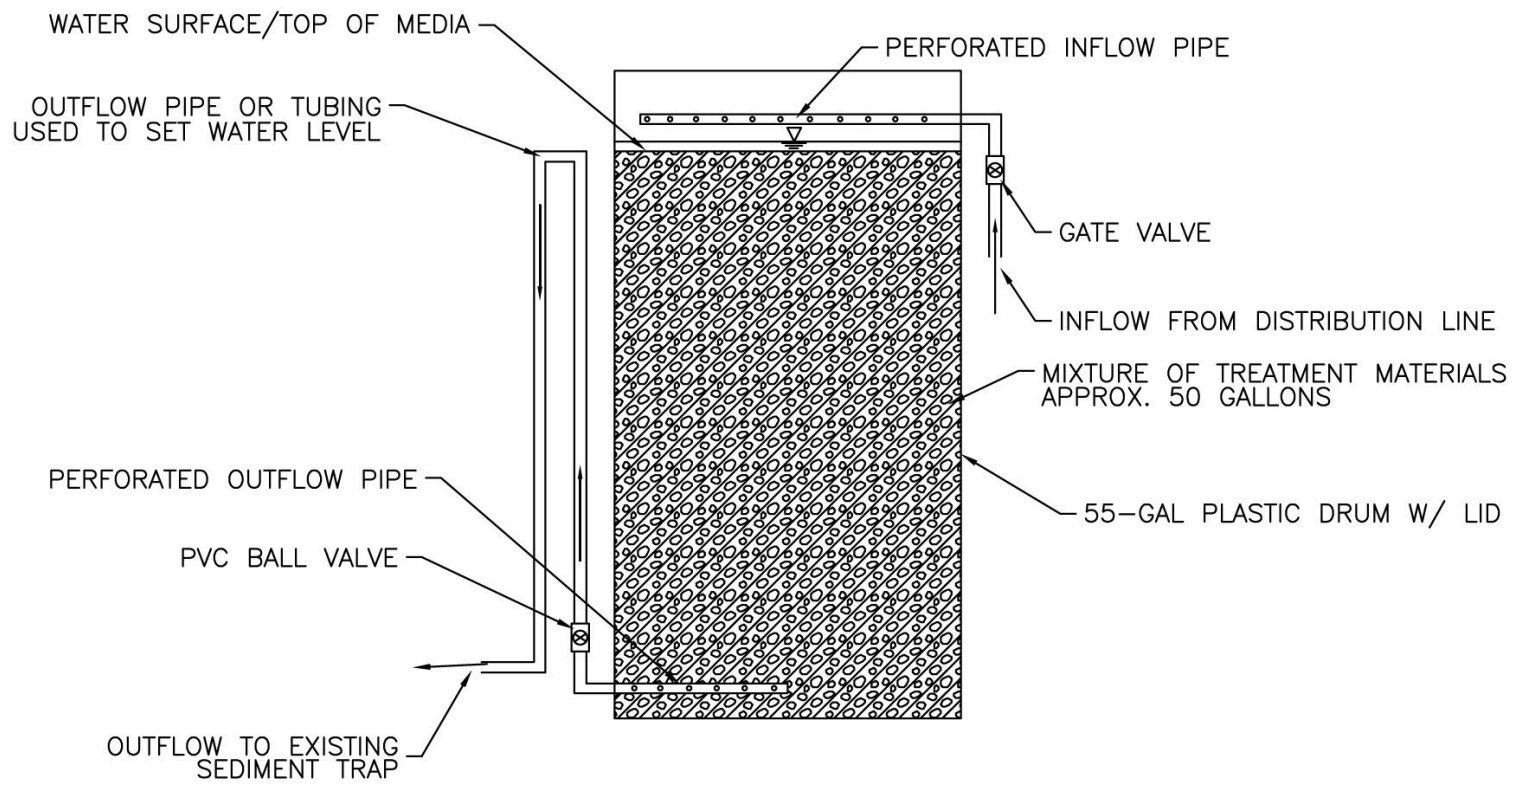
TYPICAL TEST CELL CROSS-SECTION
